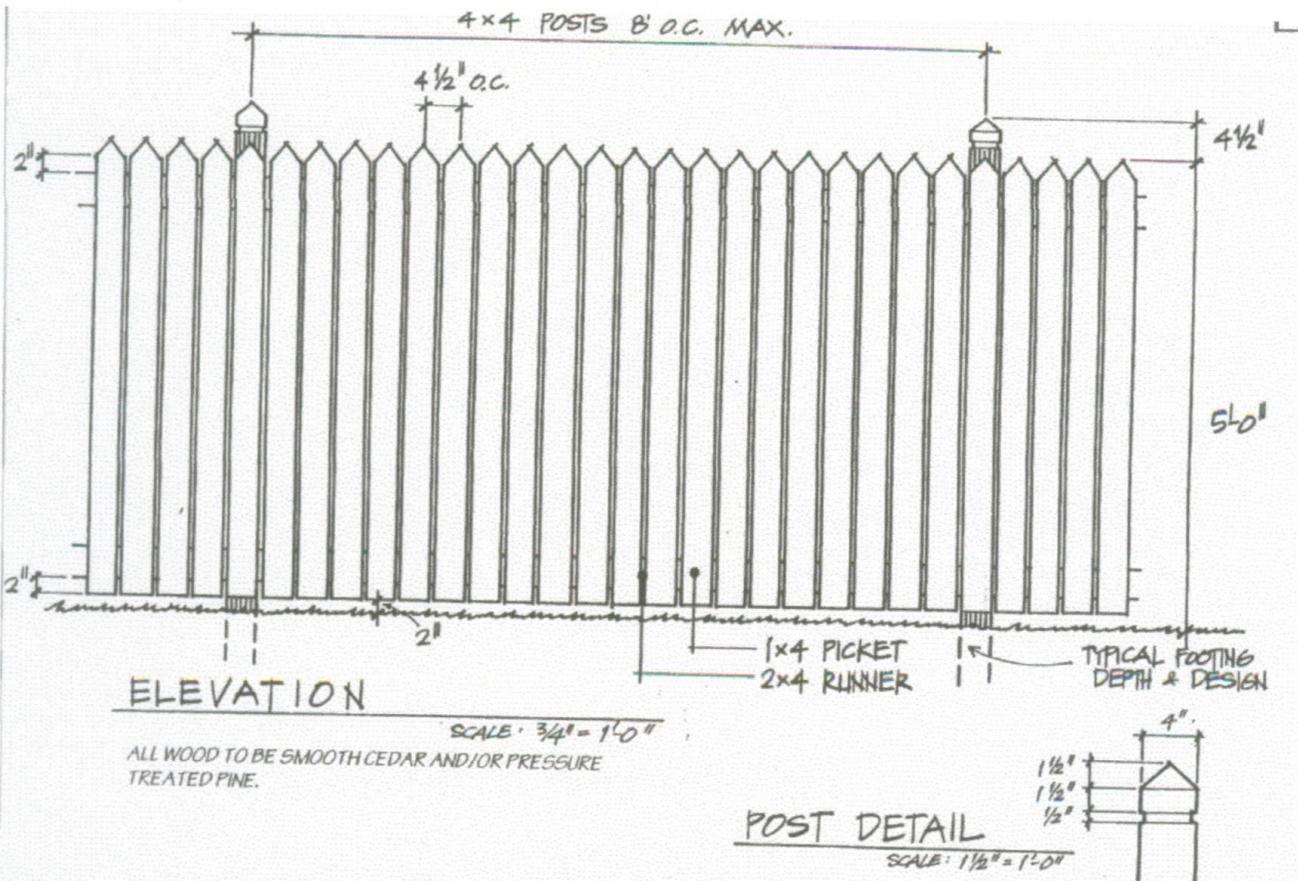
, Typical Picket Fence Specification with Typical Post Detail
